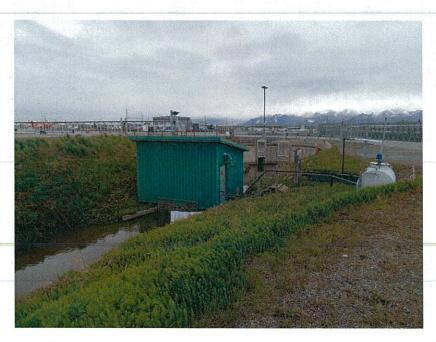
View of one of the drainage channels that routes stormwater away from the airport property. This particular channel routes stormwater through the outfall identified as outfall D. Note that this drainage channel is managed by the Anchorage International Airport and that multiple airport tenants discharge through this channel. Camera photograph #DSC05520.JPG.
